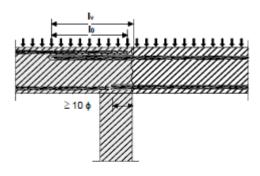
Overlap joint for rebar connections of slabs and beams
